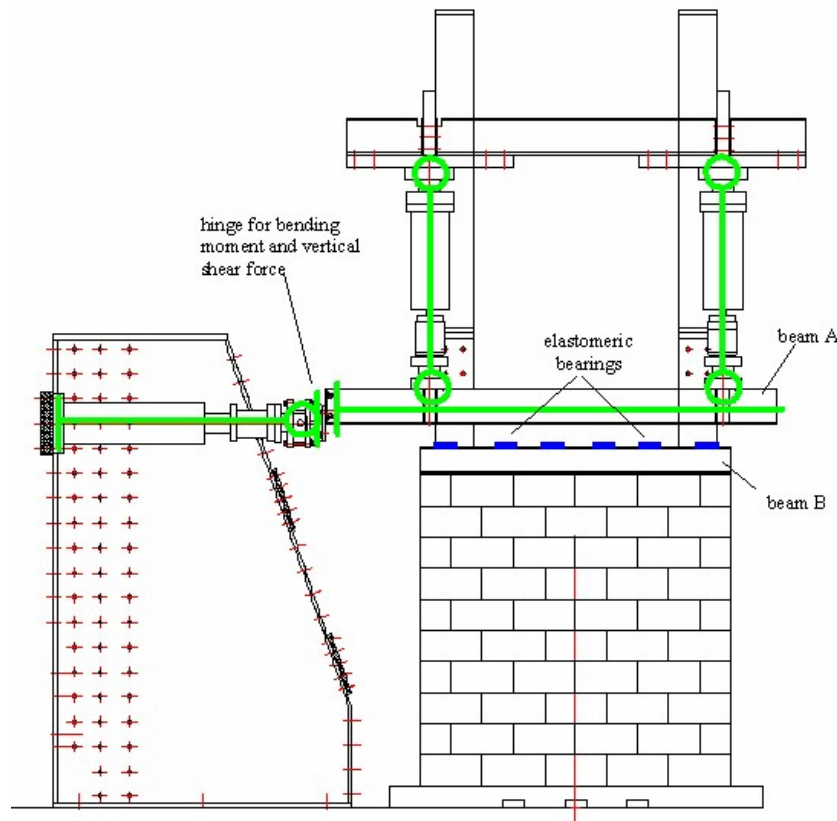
Test set-up for static-cyclic shear tests on masonry panels (Fehling and Stürz 2008)
